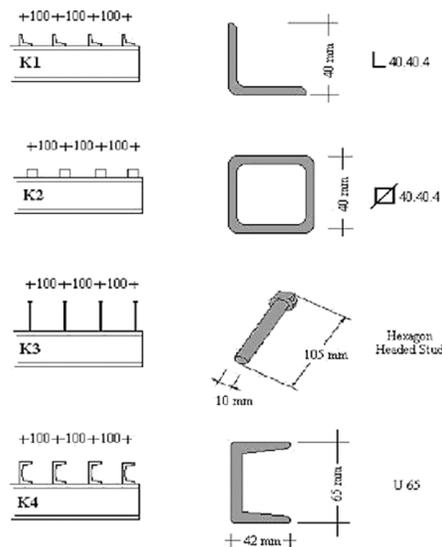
Shapes and Common Dimensions of Shear Connectors, Angle, Circular, Hexagonal or Circular Headed and Channel Section [174]
